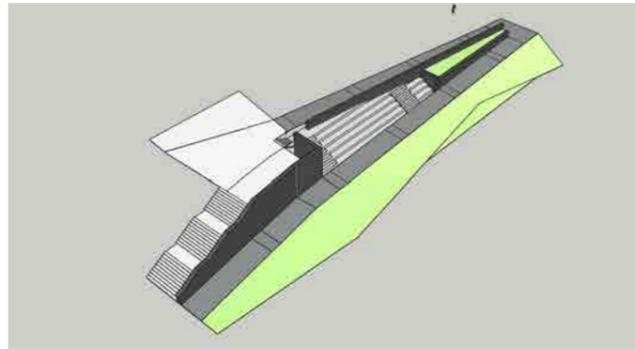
Image of the Landscape Architect's ramp & stairs proposal
